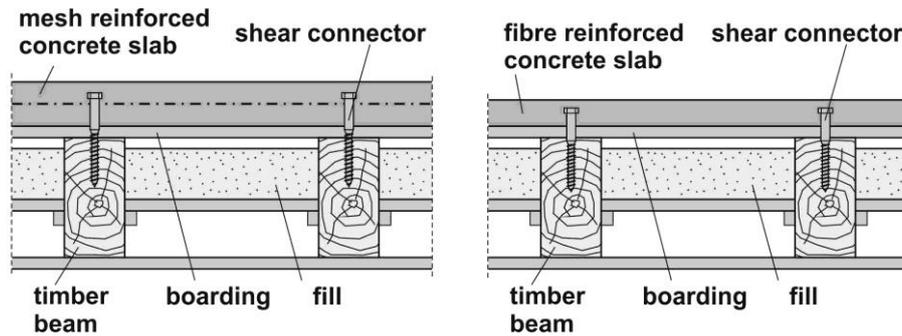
Strengthening of existing timber beam ceilings with TCC; left: application of a mesh reinforced concrete slab, right: application of steel fibre reinforced concrete
